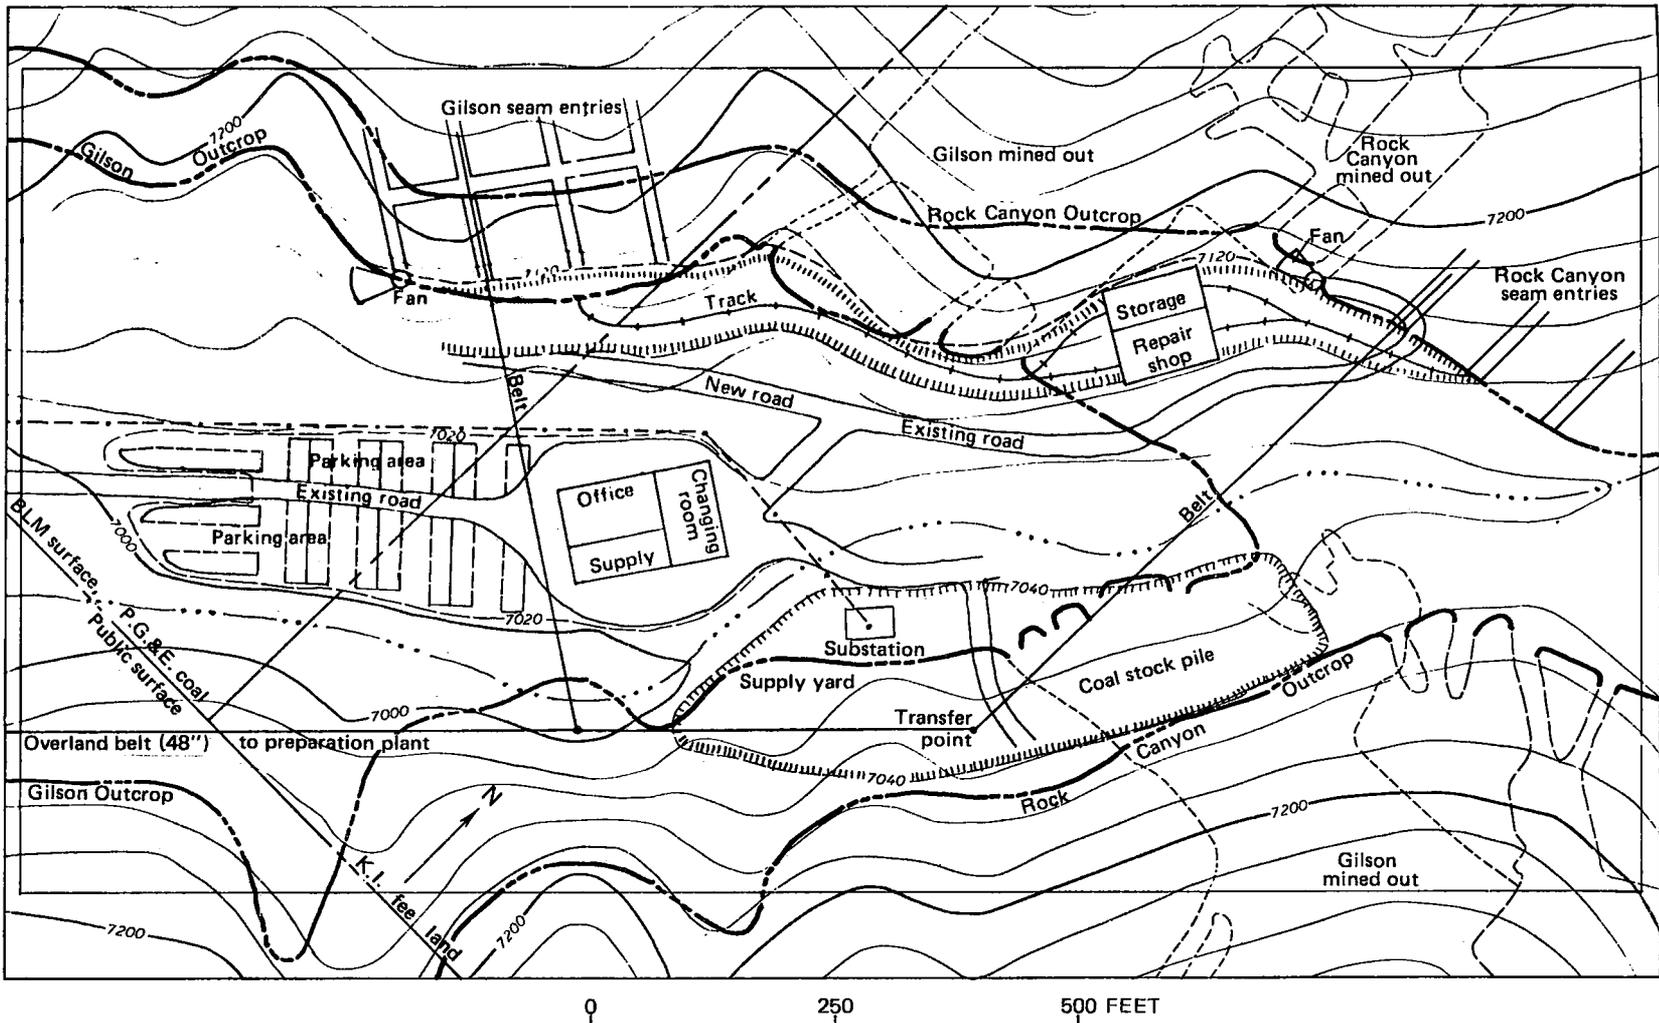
Proposed layout of surface facilities at the Dugout Canyon minesite in sec. 23, T. 13 S., R. 12 E., including topography.
